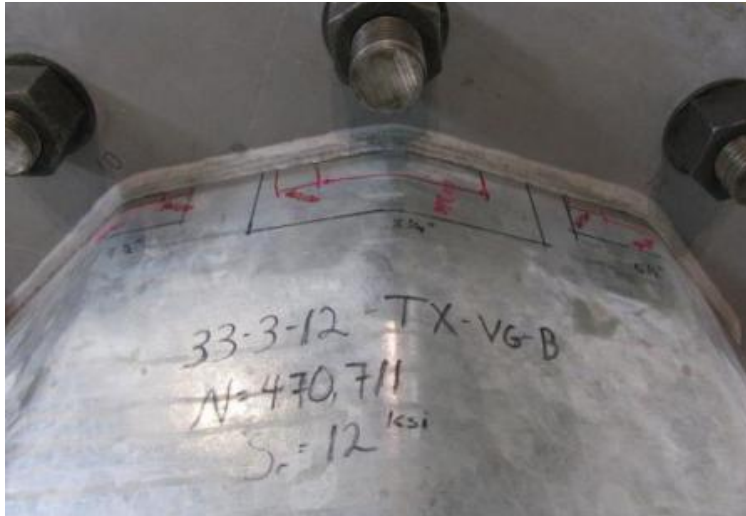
Specimen 33-3-12-TX-VG-B after Fatigue Testing
